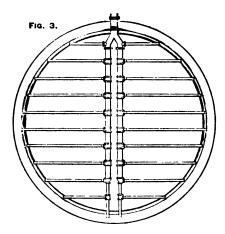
Horizontal section of bottom of tank, showing arrangement of screen collecting tanks beneath the sand.
